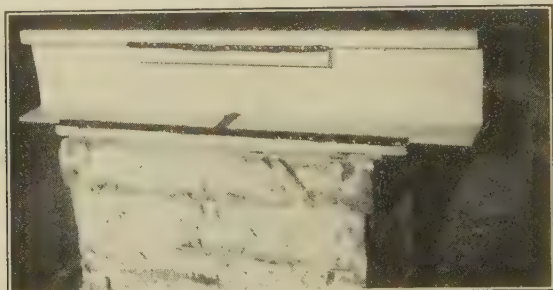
Sample base-plate joint on 7-in. T-rail.
